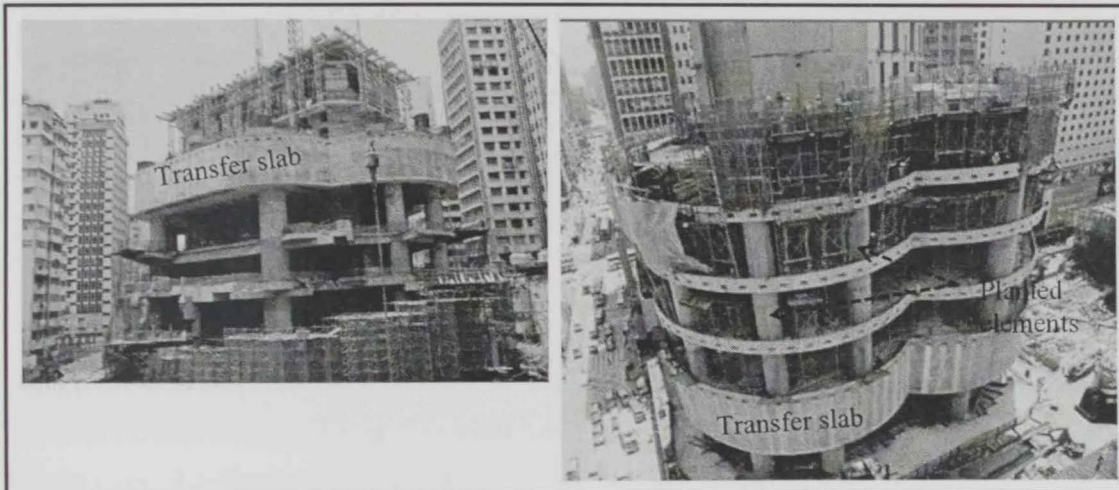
Residential building in Jordan - building 10 (Wong, 2013)
